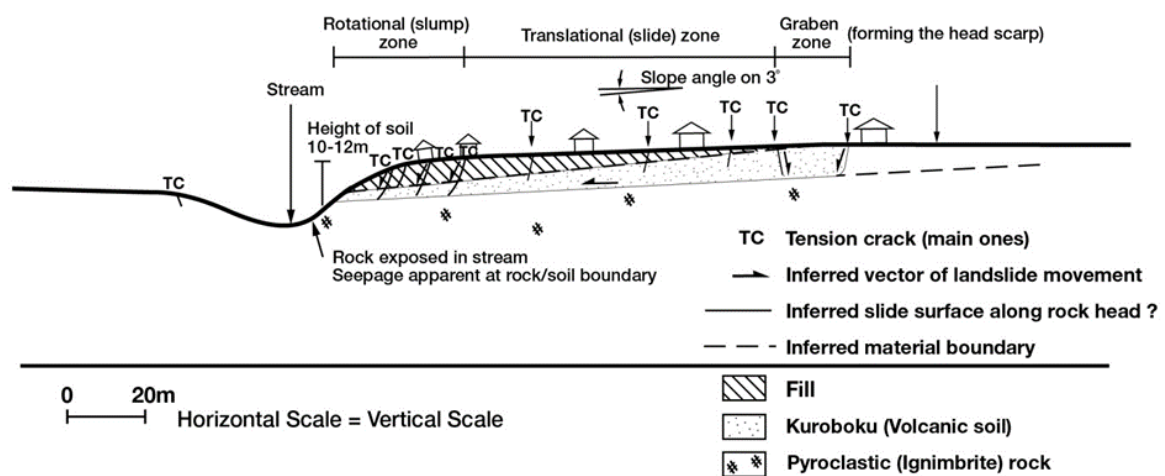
Cross-section through the earth slide/slump at Tokyu Country Town.
